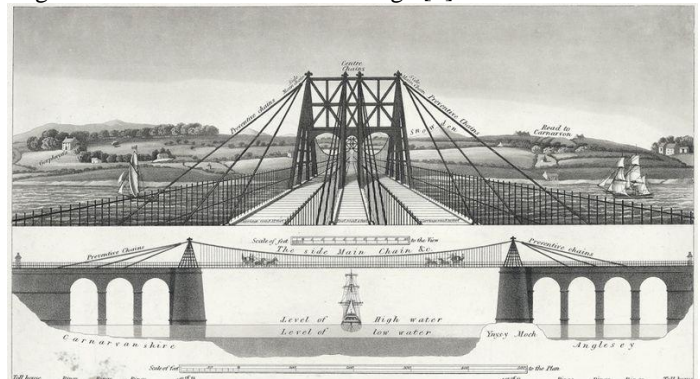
An Early Plan of Chain Bridge over the Menai Strait
